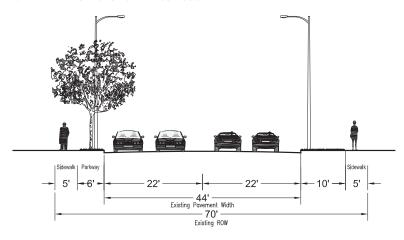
TYPICAL SECTION - MILLIKEN AVENUE
